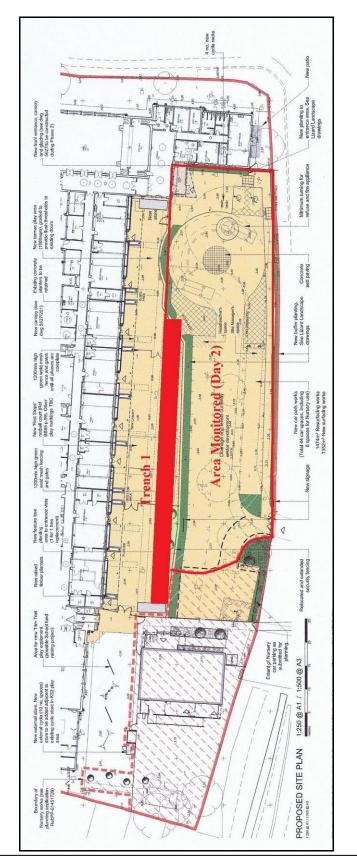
Highfield Junior School, Eastbourne: Development Plan showing the area monitored adjacent to Dallington Road & the location of Trench 1 (Adapted from architects drawing)
